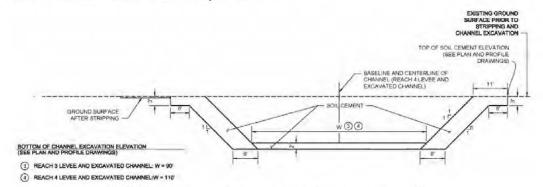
Exhibit A: Typical Channel Cross-Section (Source: EIR/EIS)
